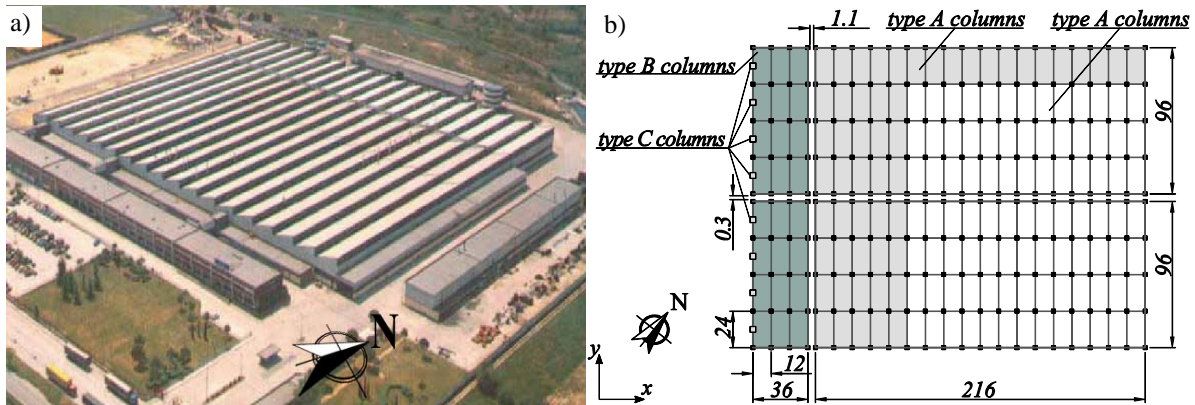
Aerial view of the whole facility (a) and schematic drawing illustrating the plan layout (units: m) (b).
